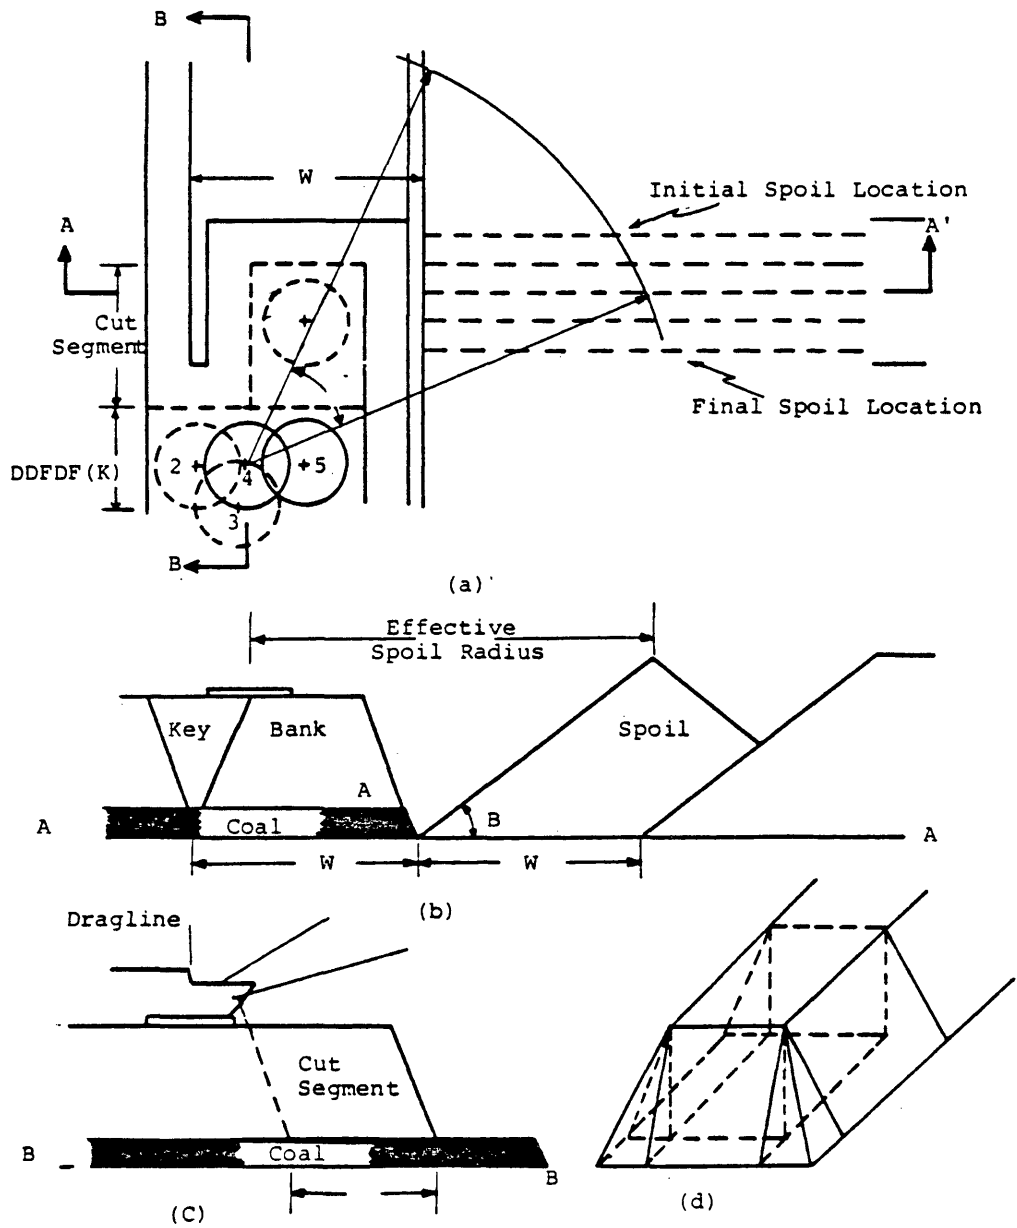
Plan and Cross Sectional Views of Pit Geometry for the Main Cut Removal of Side Casting Model.
